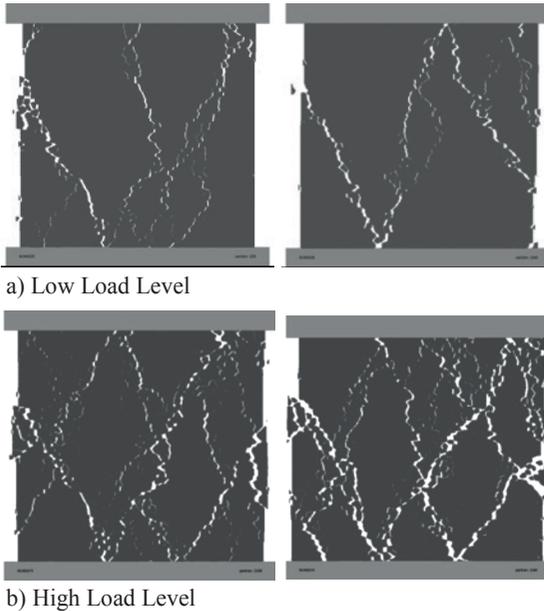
Crack patterns of concrete specimens under low and high load levels
